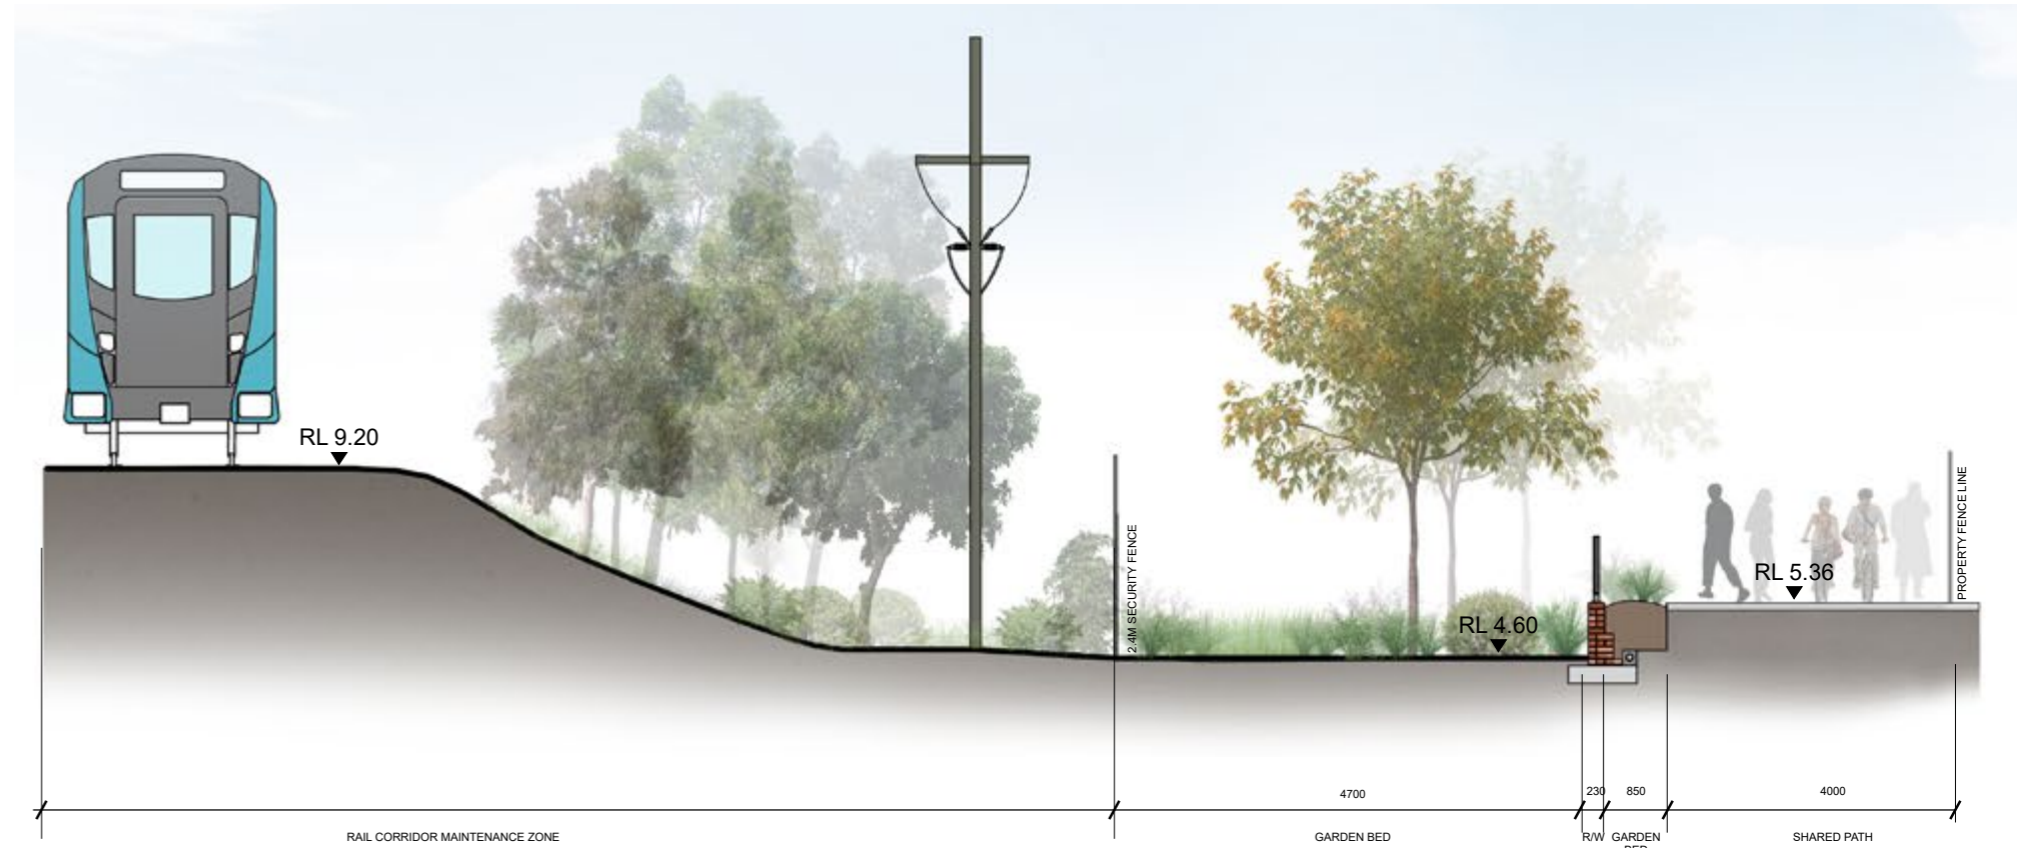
Shared pathway where low walls are required to allow overland flow through vegetation
